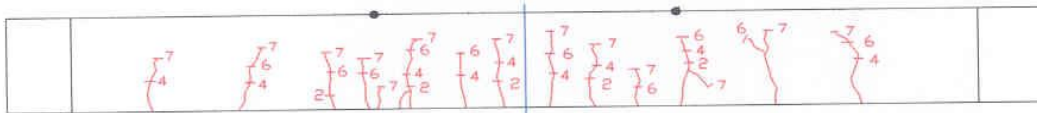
Steel yielding-concrete compression failure (Control beam)
